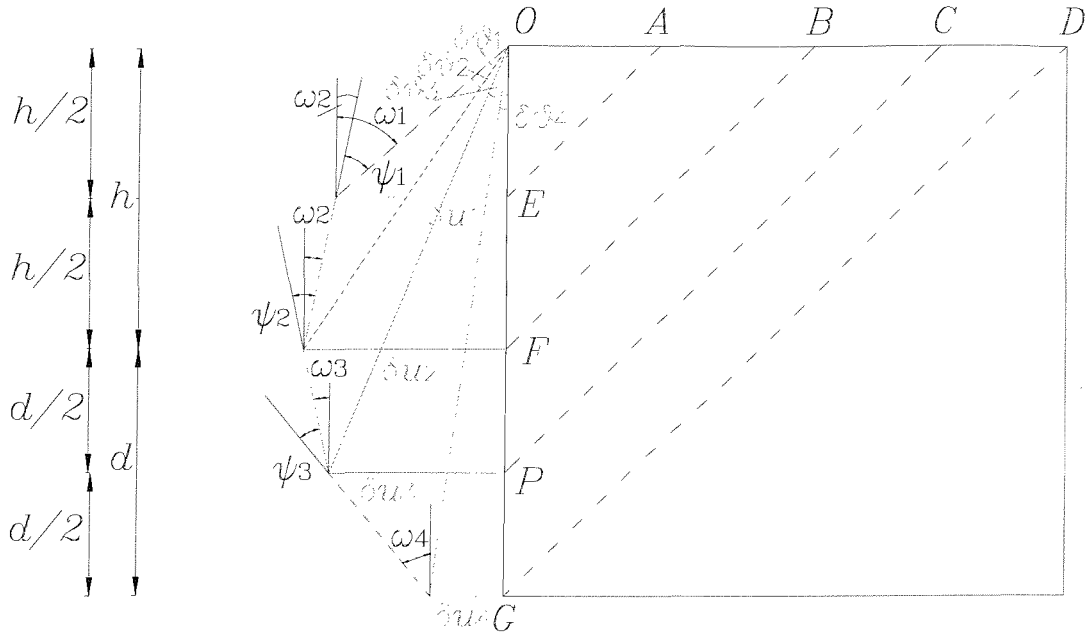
Rotations and displacements at discretised points along a retaining wall propped at the crest.
